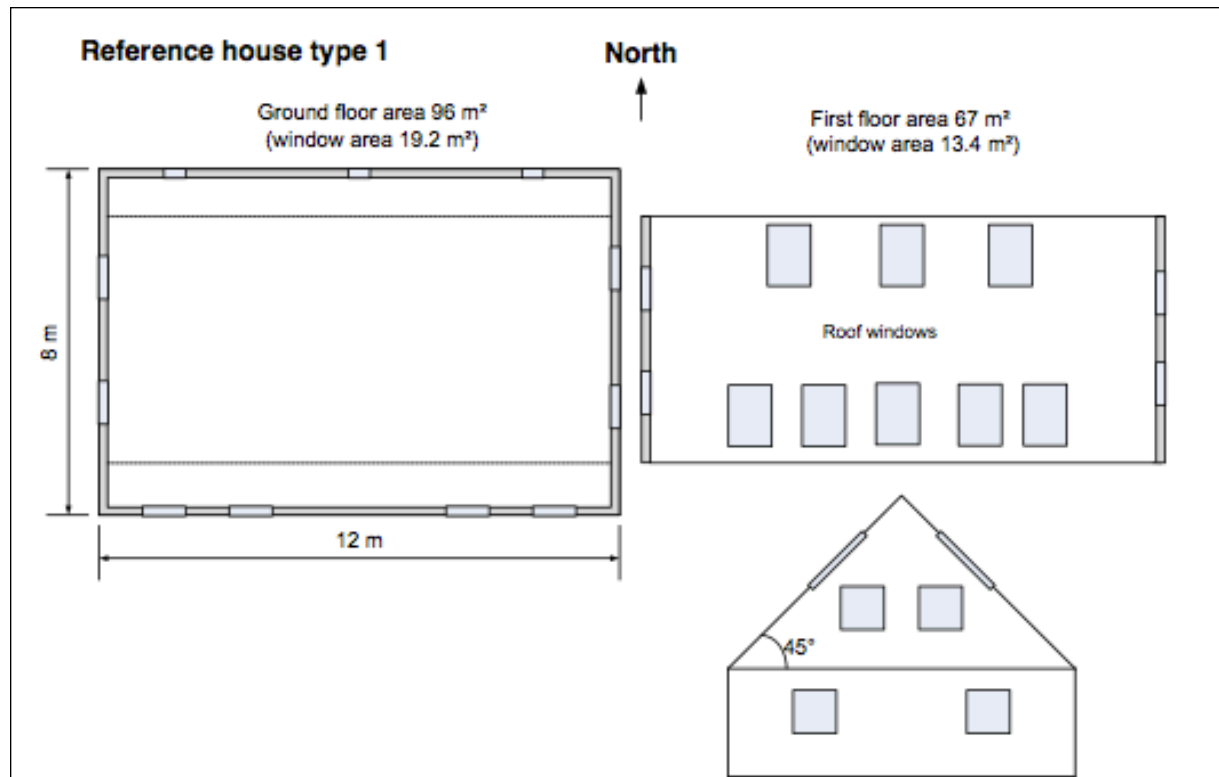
Outline of the reference house type 1 with 45° sloped roof construction
